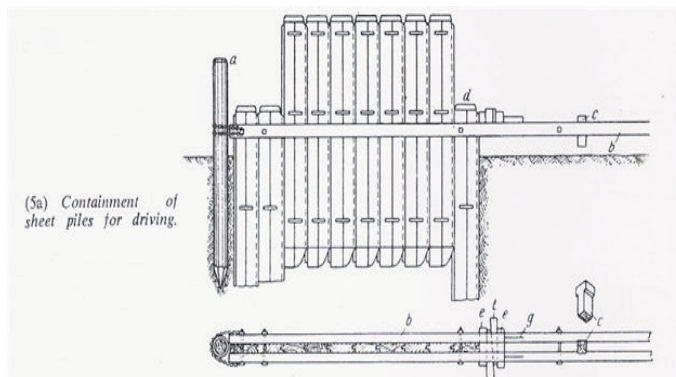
The installation sequence for wooden sheet pile wall [Leimdorfer 1876]
